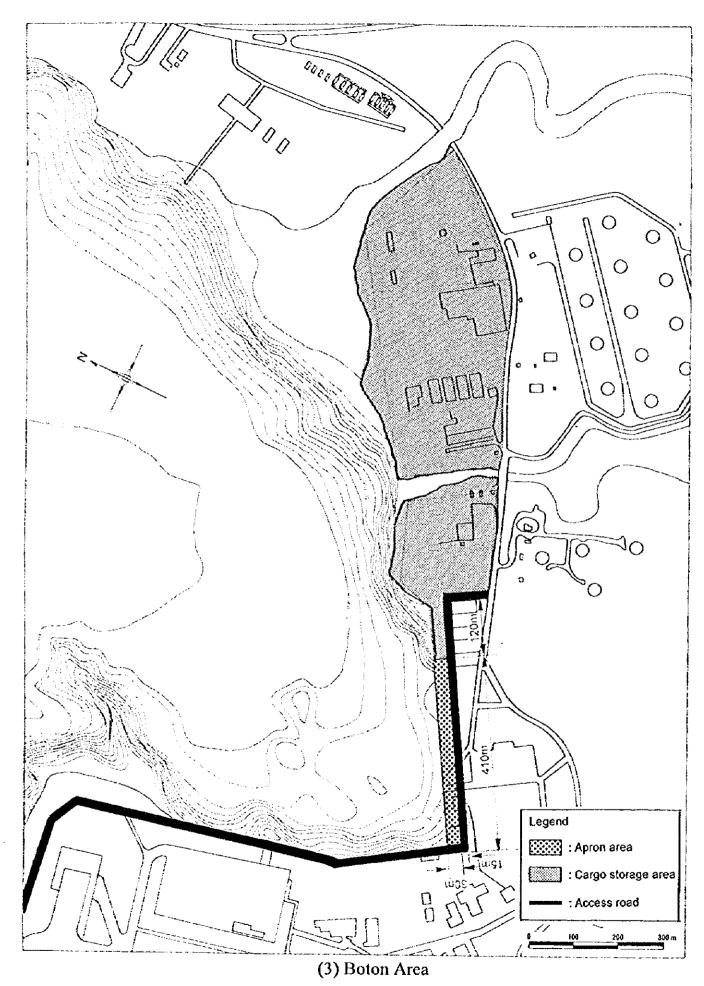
(3) Layout Plan of Alternative-3 7-122
